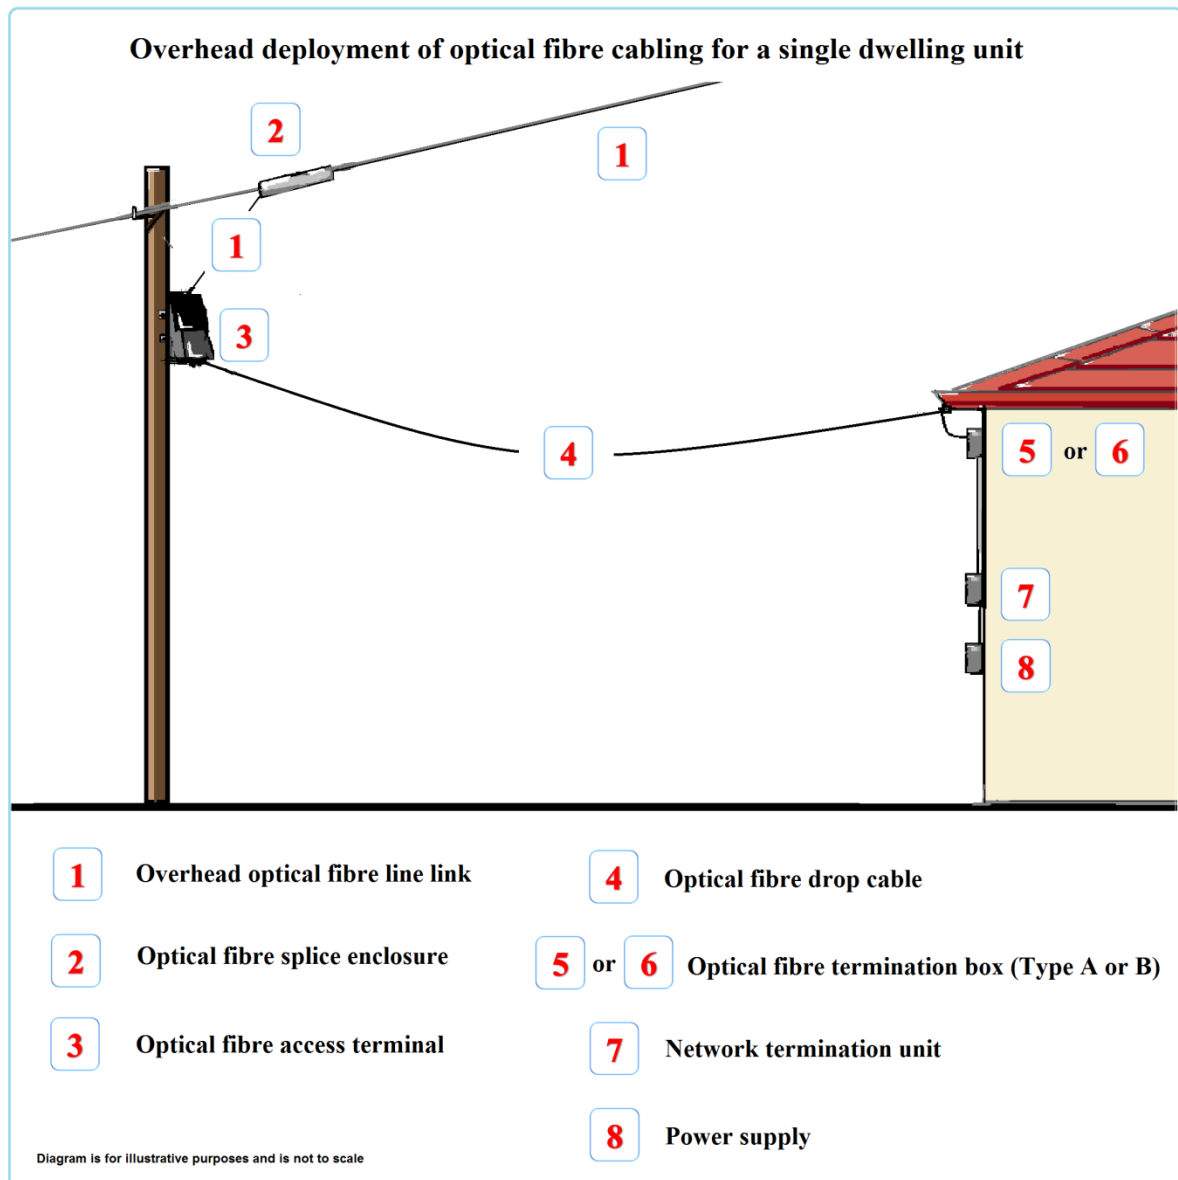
identifies the facilities required to deploy aerial cabling in streets and connect premises.
